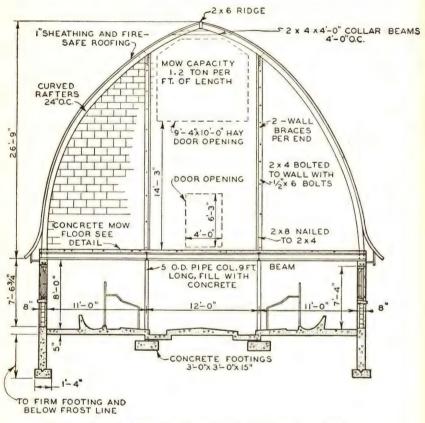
Section of Dairy Barn Showing Haymow Floor and Columns
